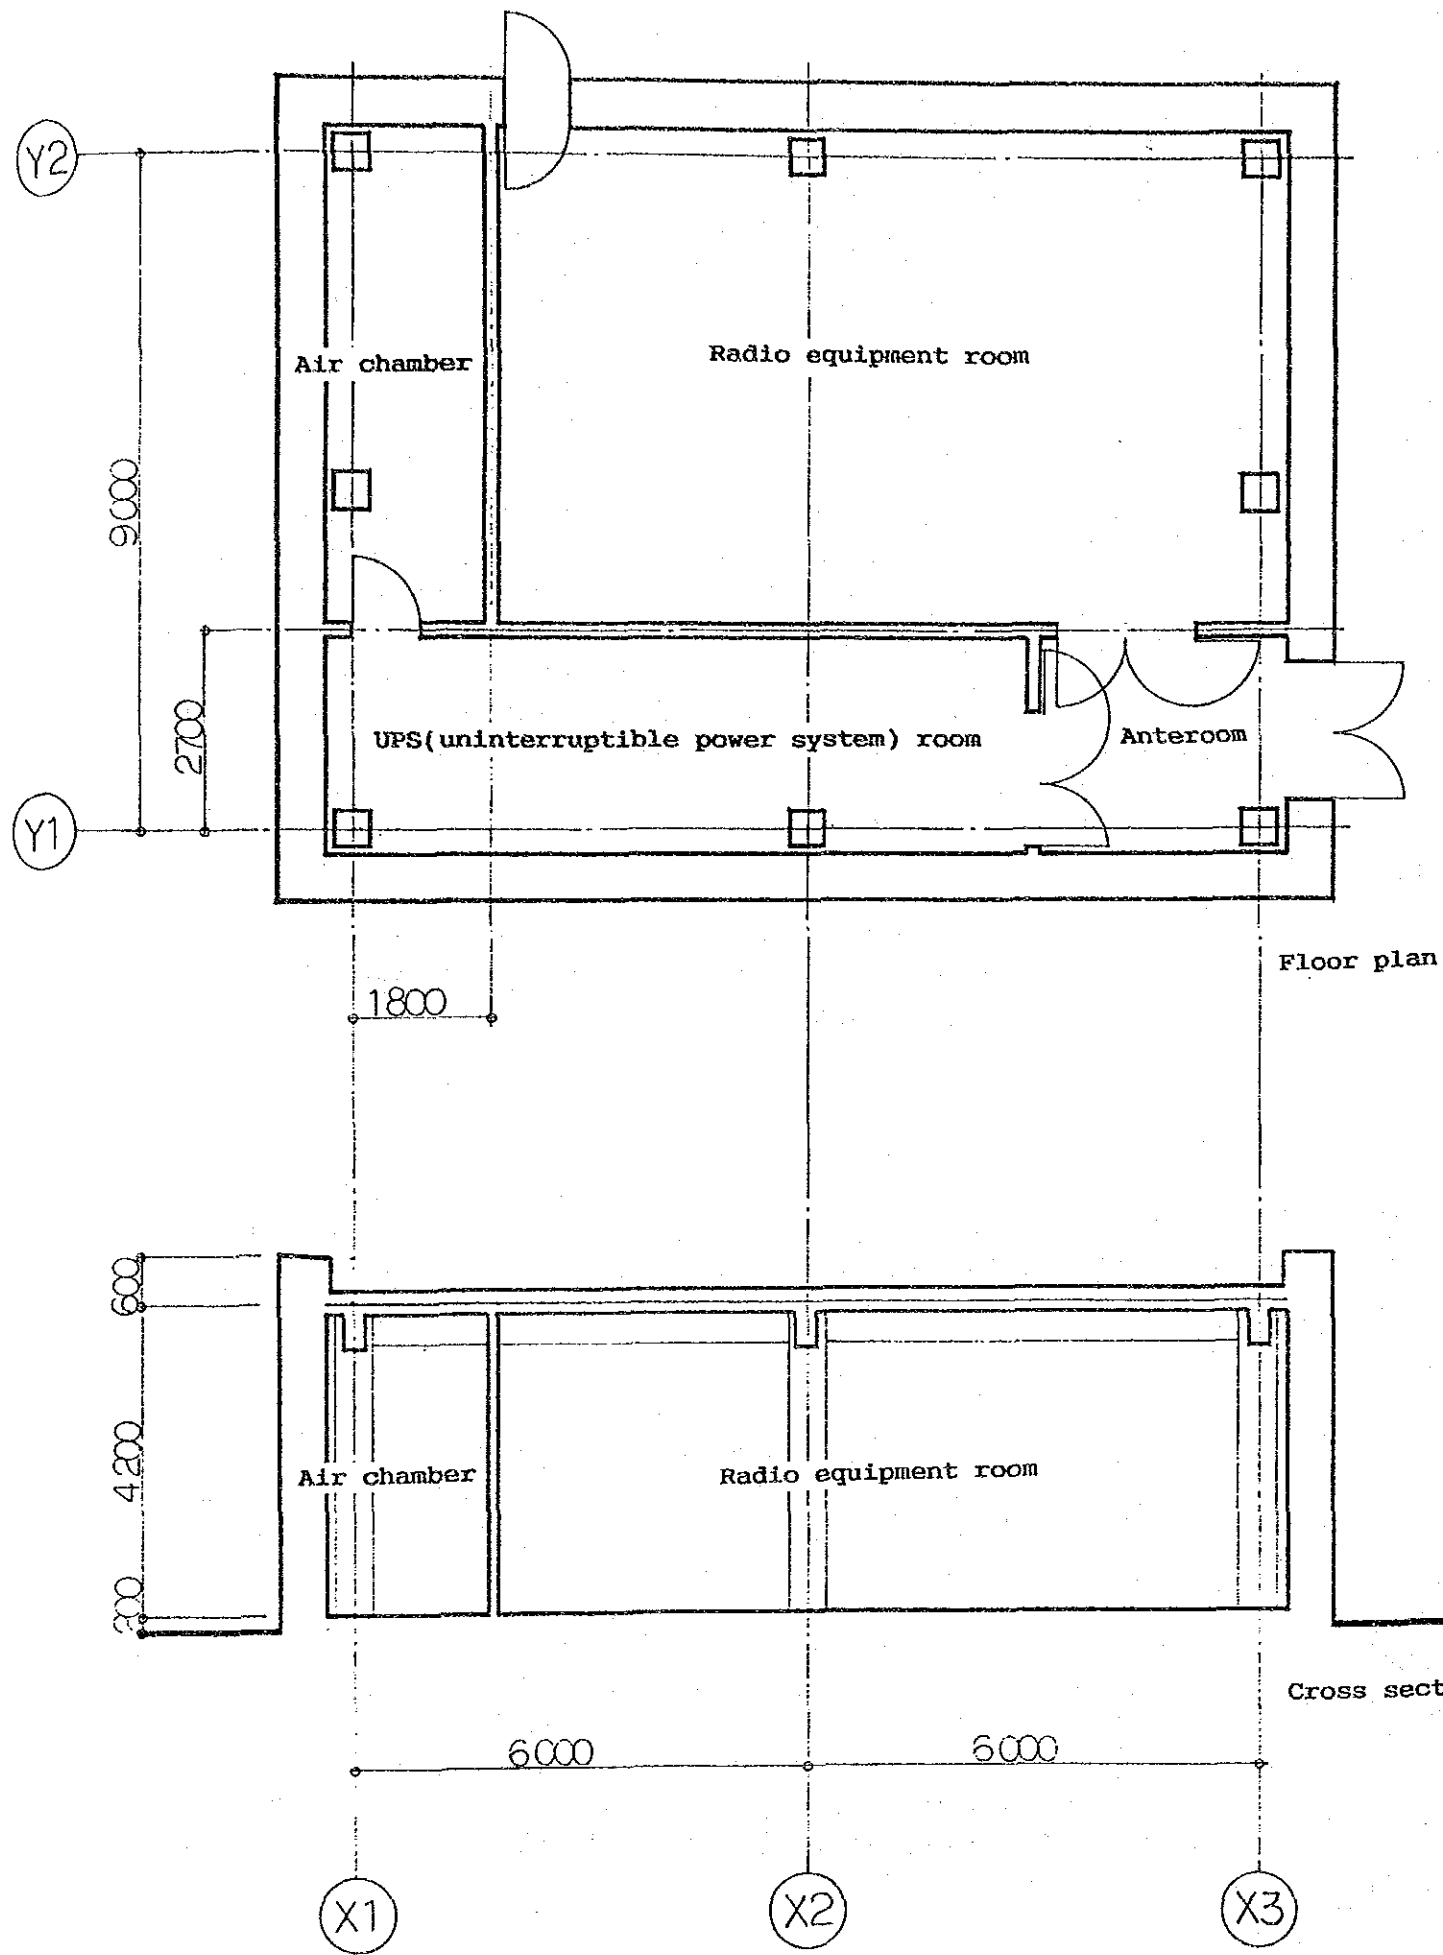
New Building for INTELSAT Earth Station, Floor Plan, Cross Section, Elevation Scale 1/100
